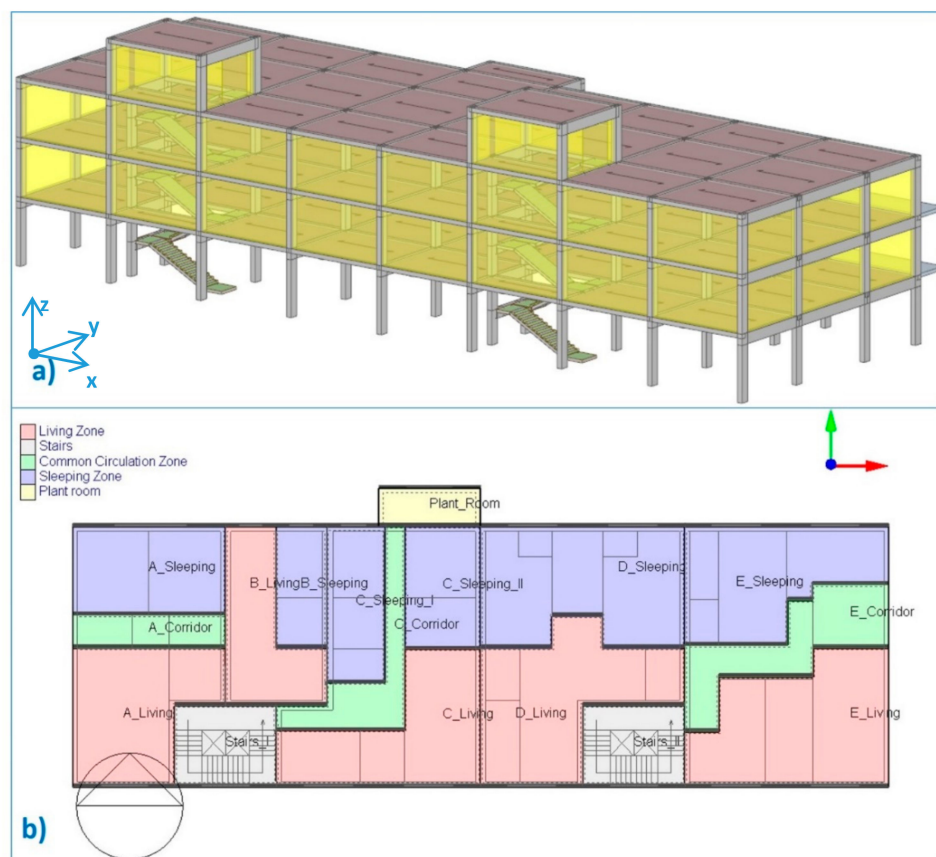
Building geometry: (a) 3D view; and (b) plan view.
